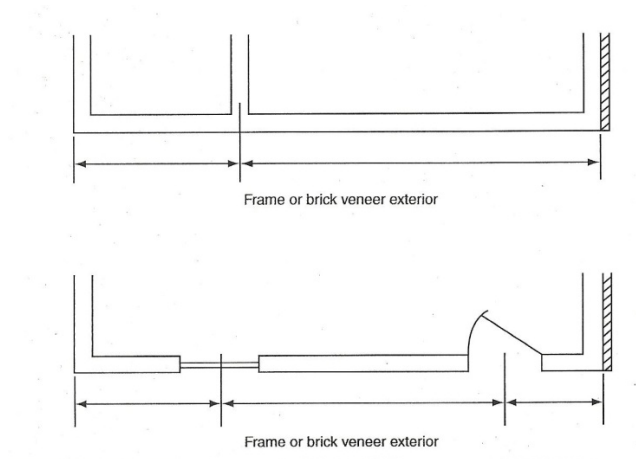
Dimensioning Windows in Masonry and Frame Buildings
